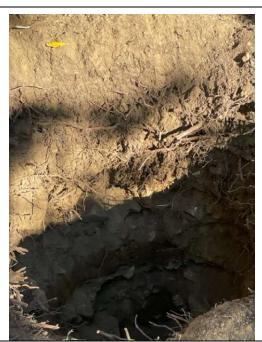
a. Pit 1. Photo 1-b. View from southeast to northwest across pit.
